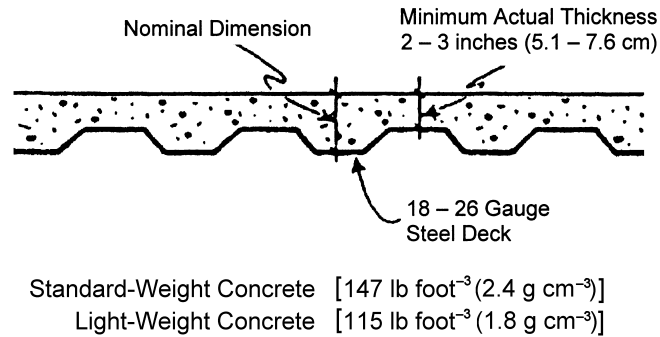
Schematic of a typical concrete floor slab poured on a steel deck. The minimum thickness *should* be used in calculating the barrier thickness.
